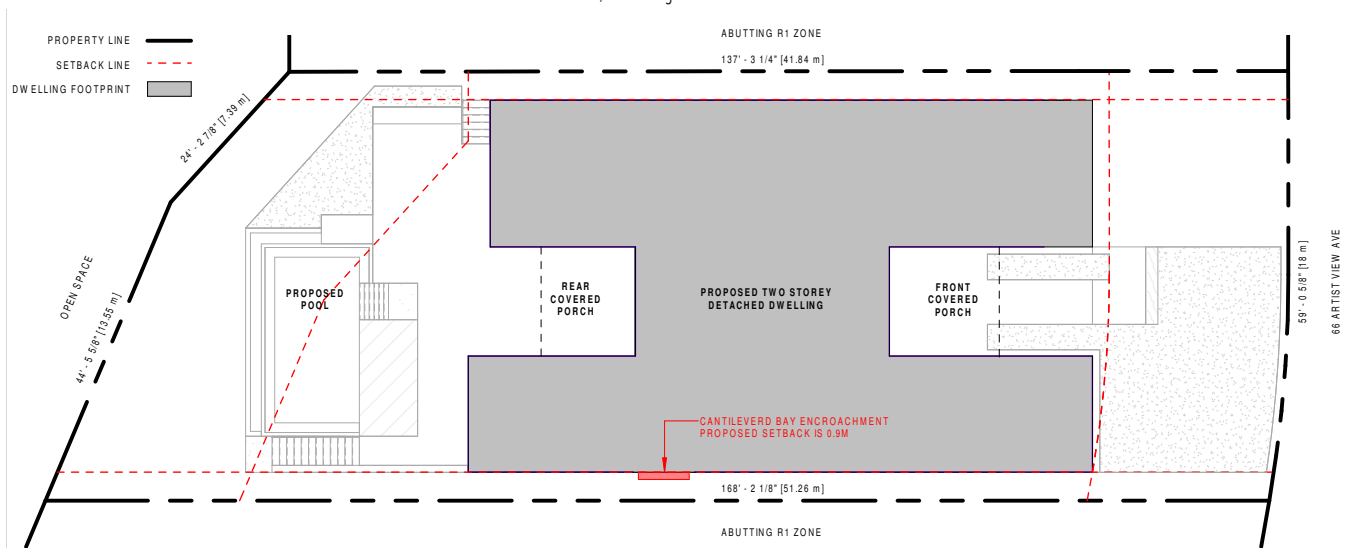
Portion of cantilevered bay that is impeding into the Interior Side Yard Setback (south)
